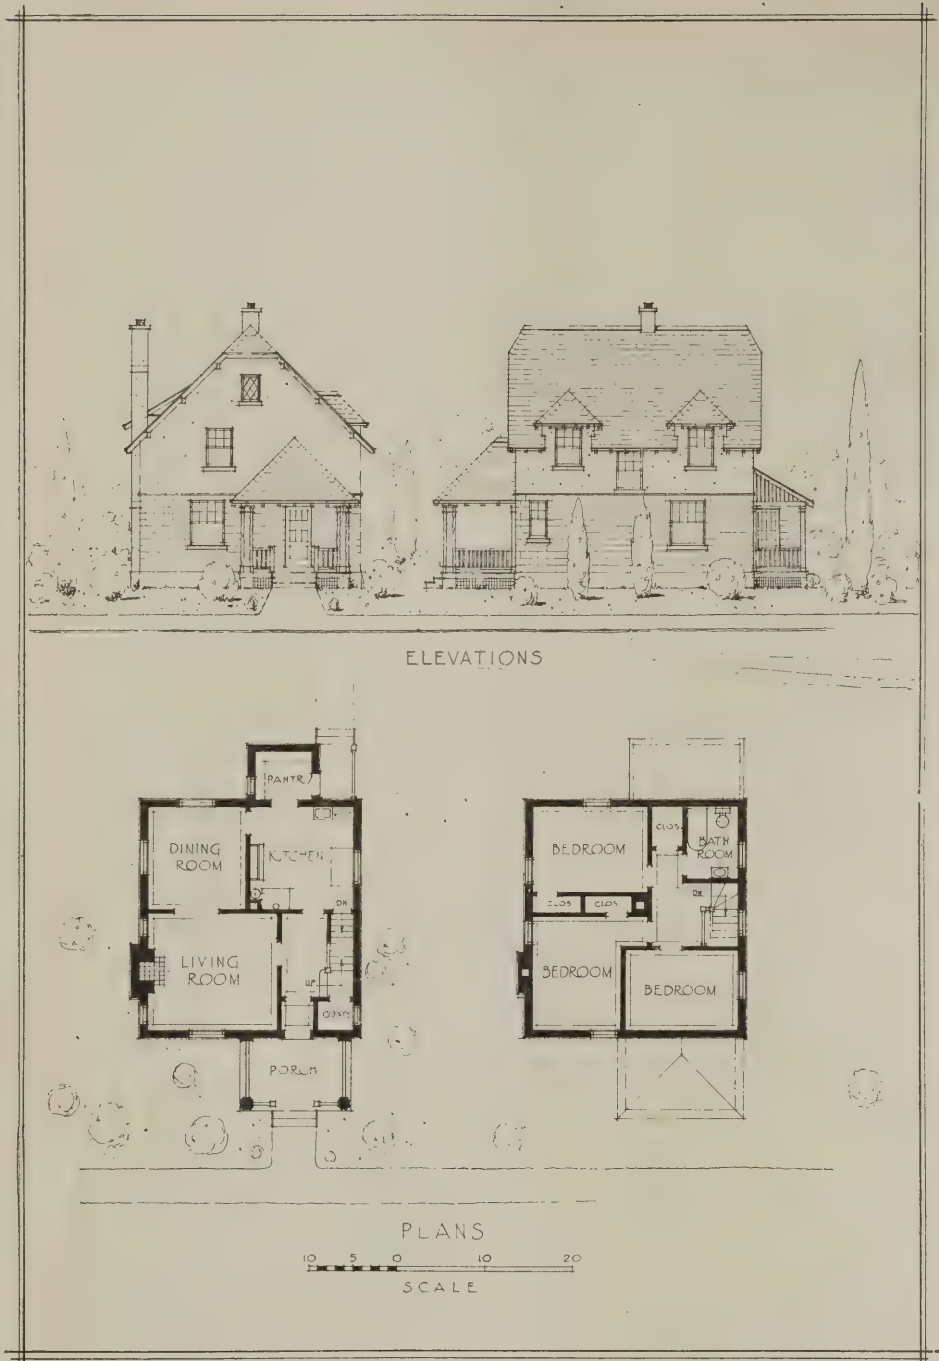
Six-room two-story house with open porches and gabled roof. Walls of concrete block, using both granite block and stucco surfaces
